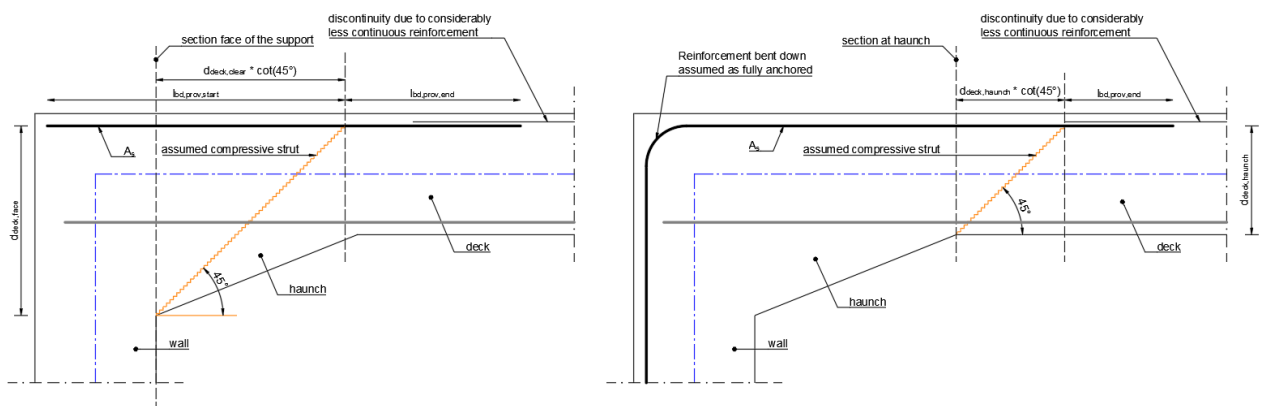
Schematics of determining the provided anchorage length of the top reinforcement in section in the clear (left) and section at the haunch (right)
